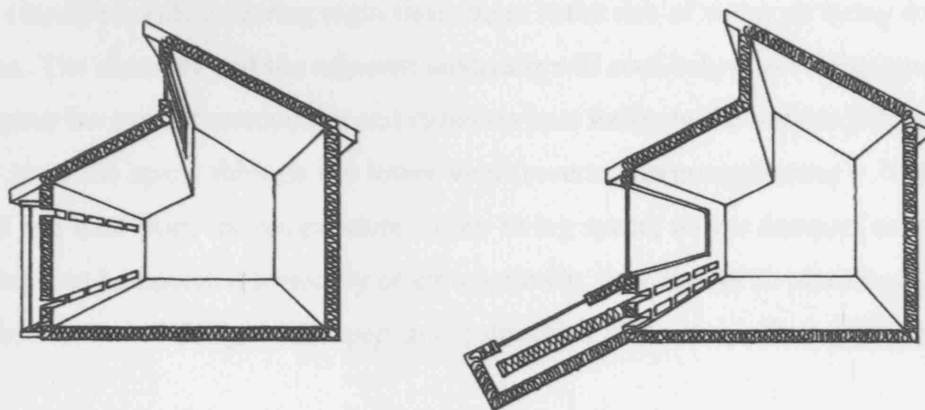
Location of TAPs: wall-mounted and below floor in angle
